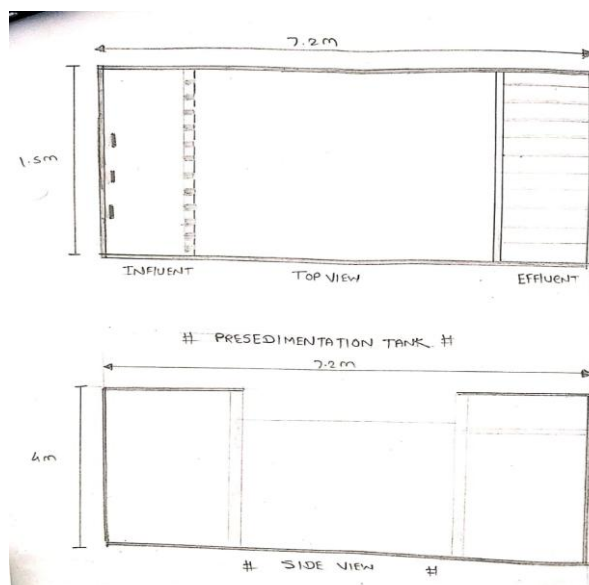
Primary Sedimentation Tank (Plan and Cross-section)
